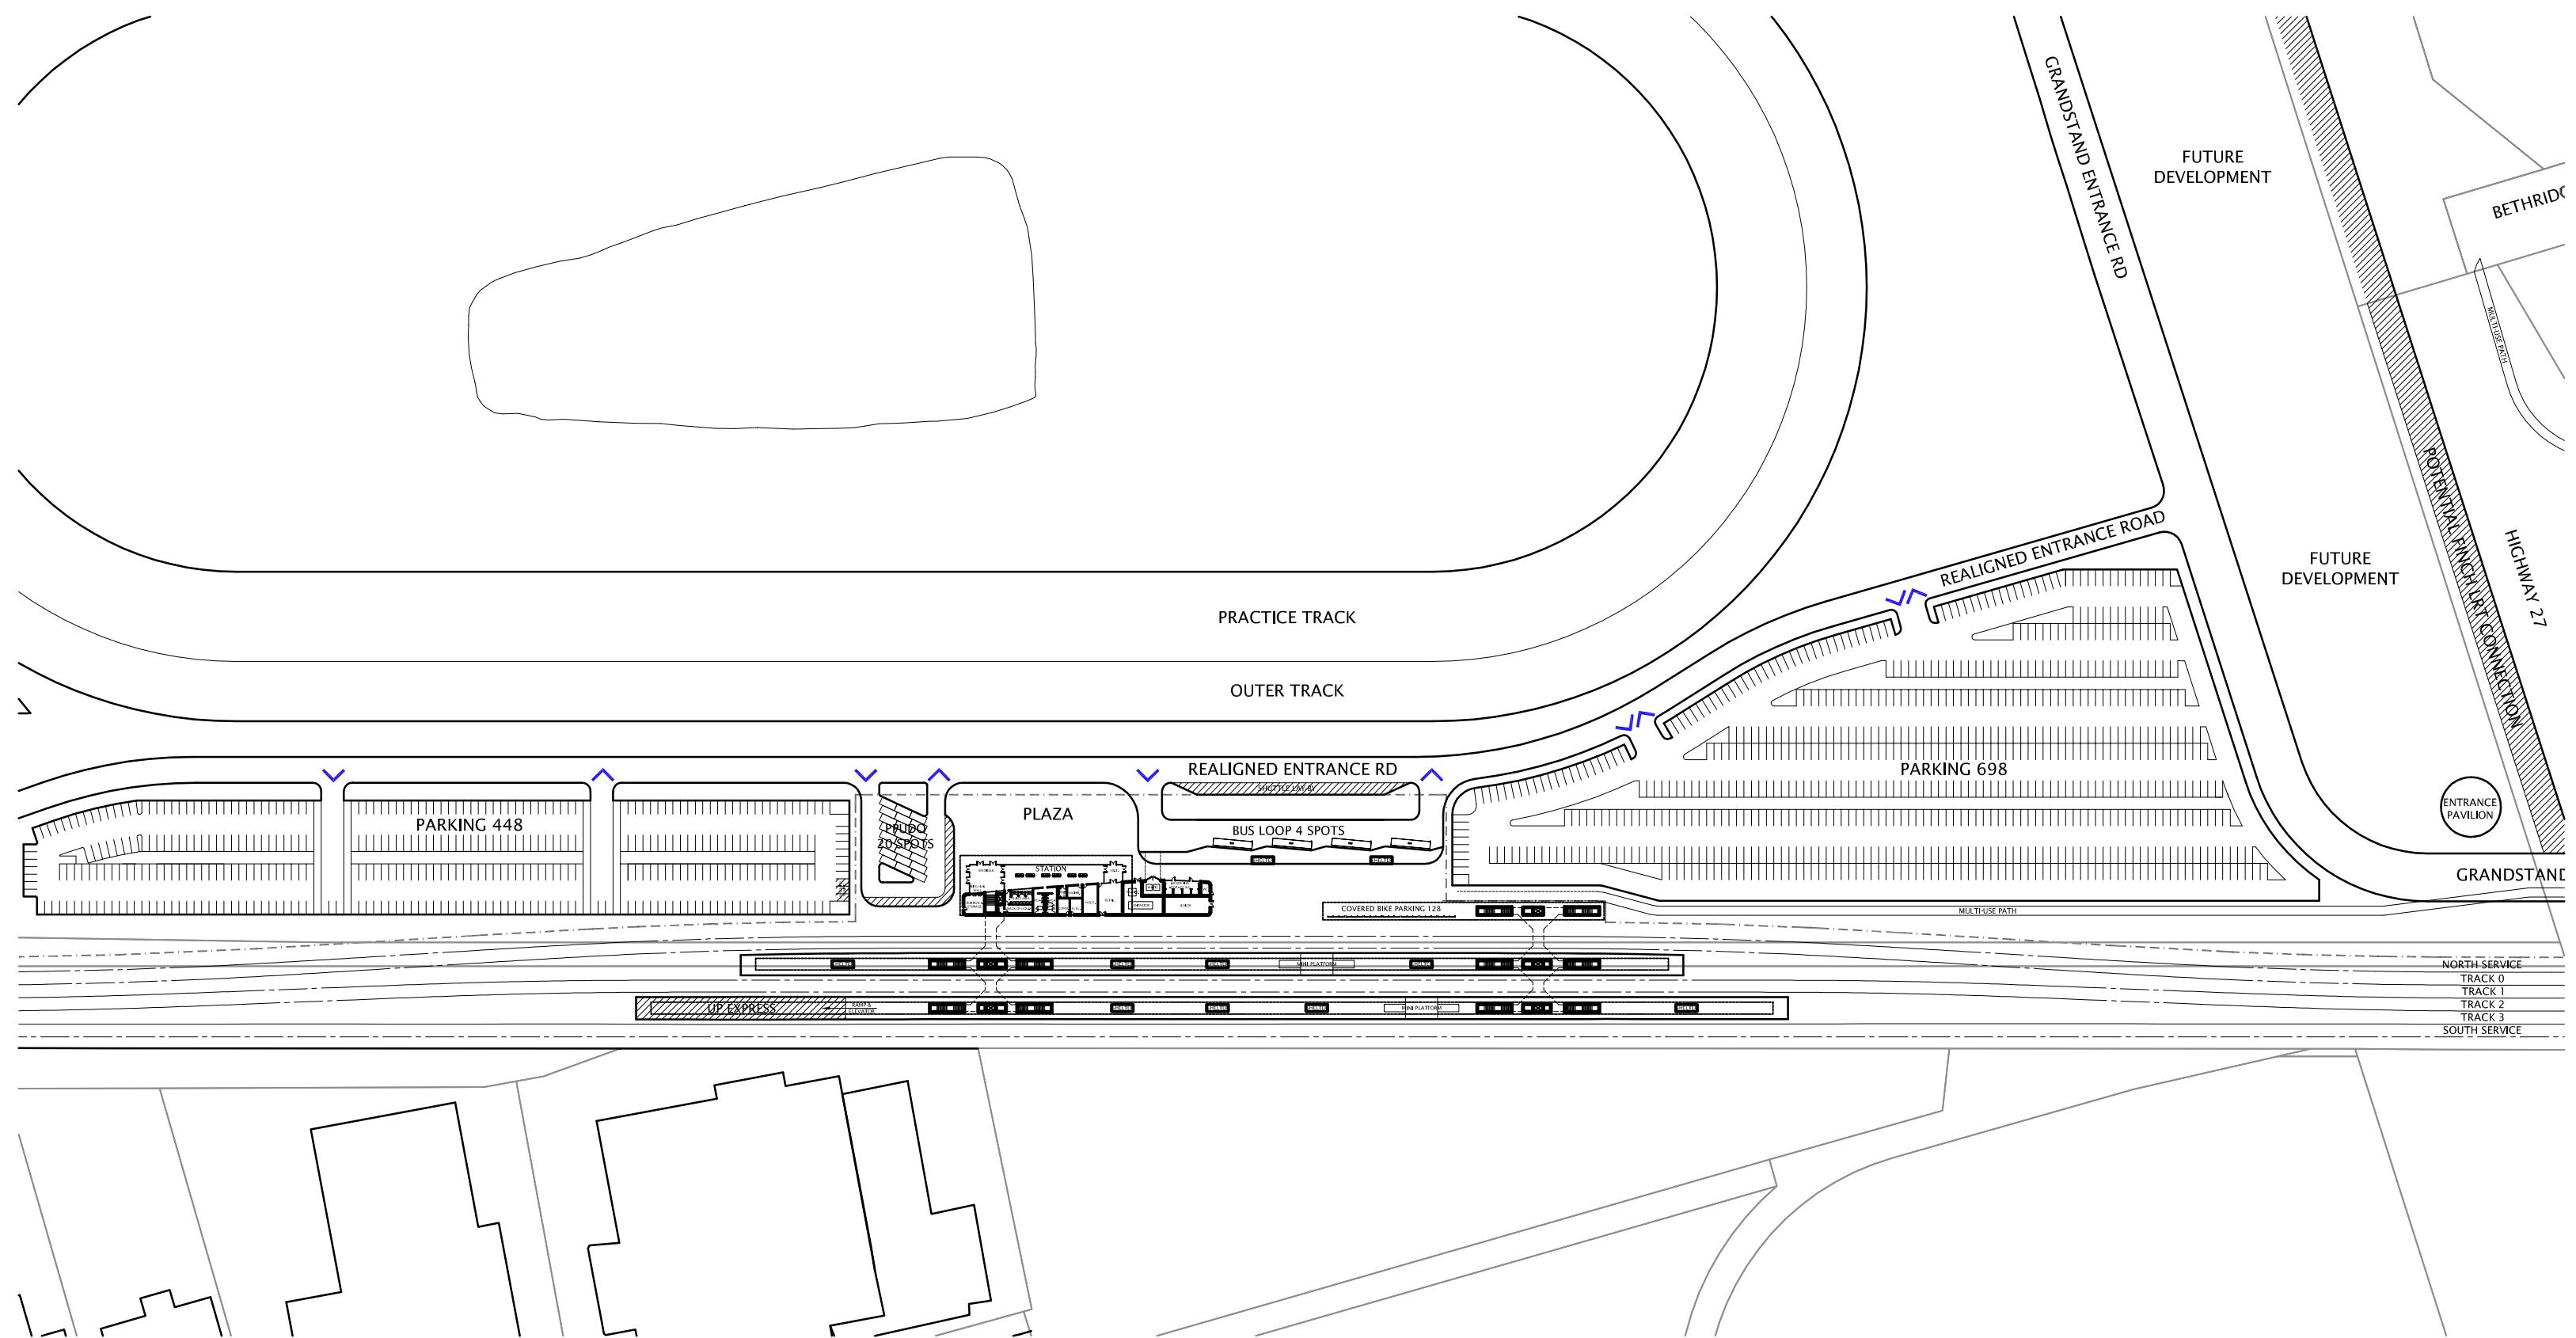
Highway 27-Woodbine Station Site Plan Layout
